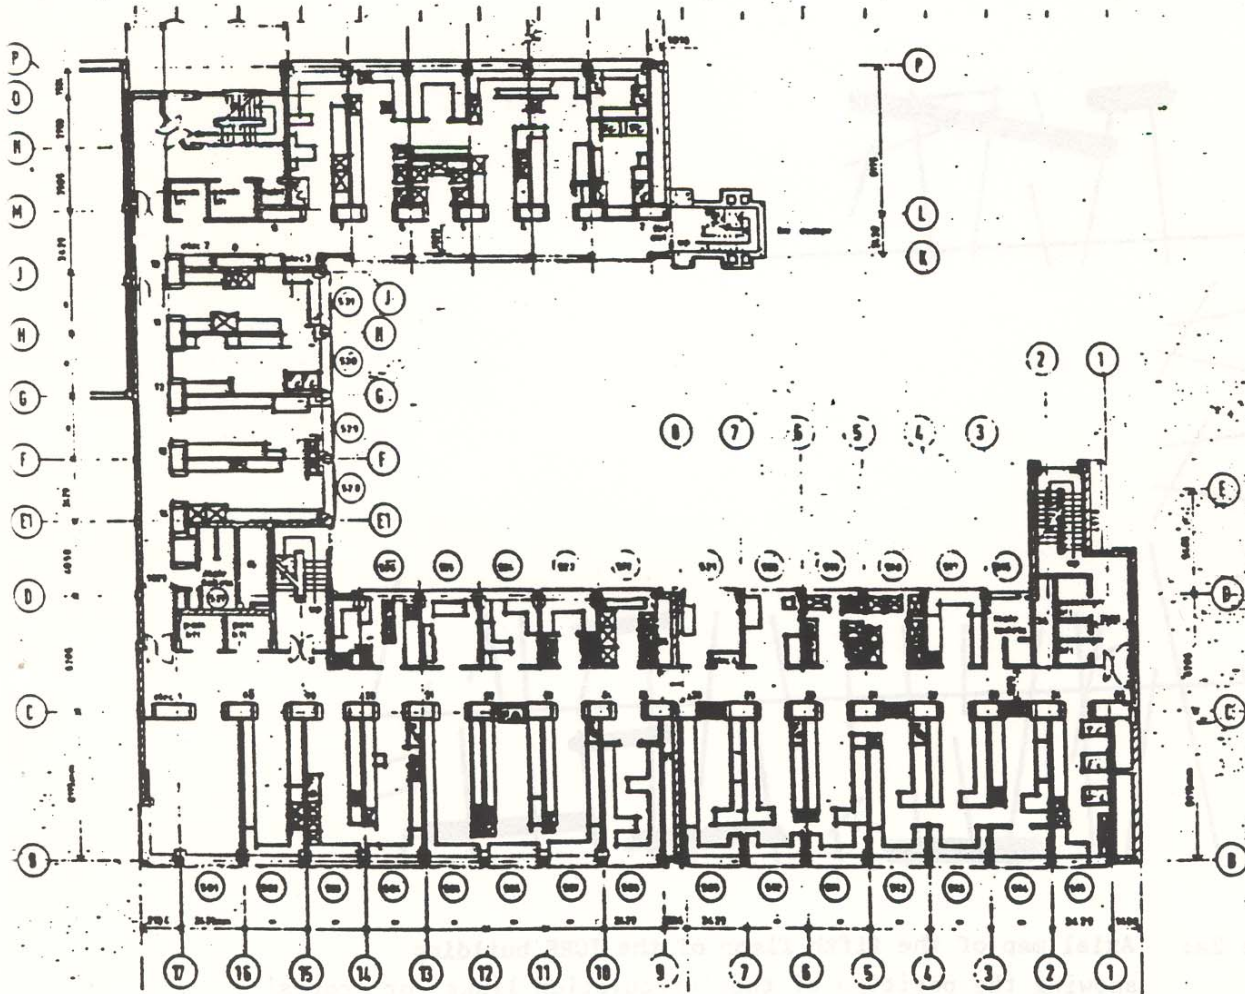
5th floor plan of ICRF laboratories showing bench layout
